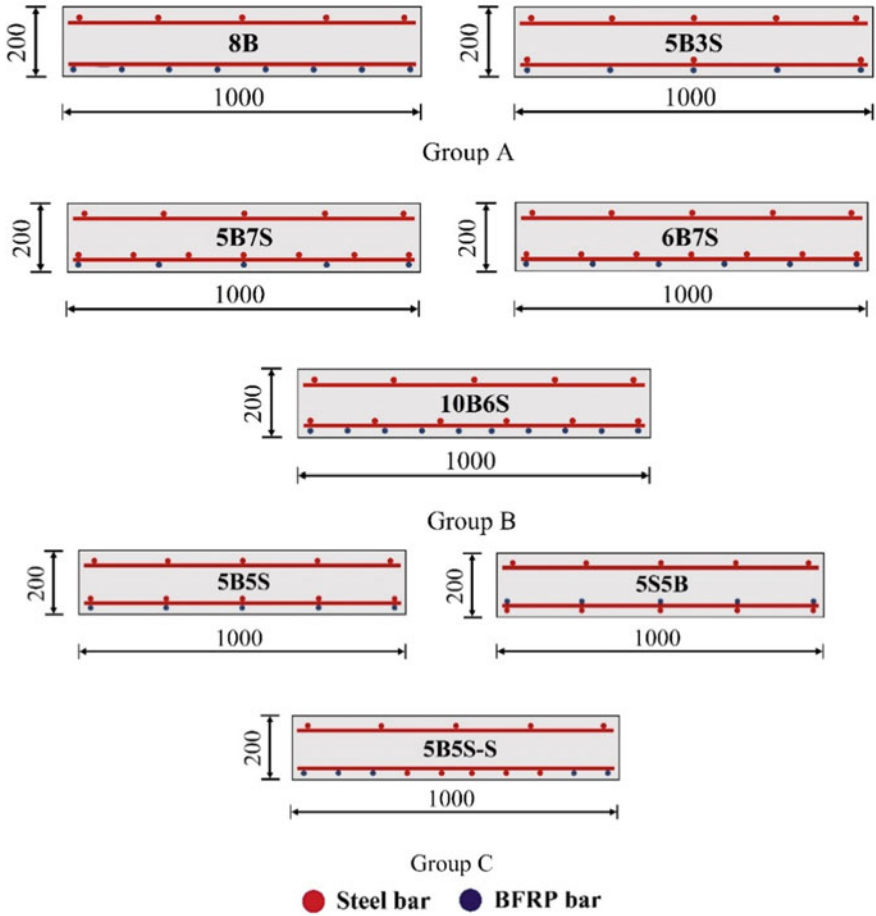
Reinforcement details of tested deck slabs. *Note* Dimensions in mm
